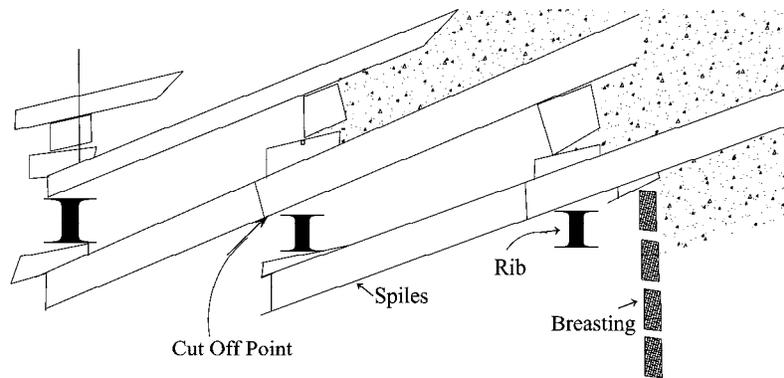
Spiling (Forepoling) Method of Supporting Running Ground
